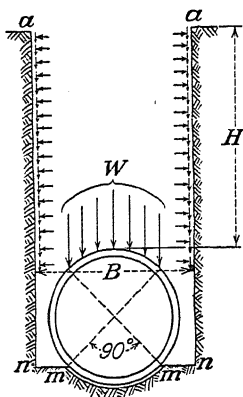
Typical condition of bedding and loading of pipes in trenches.
